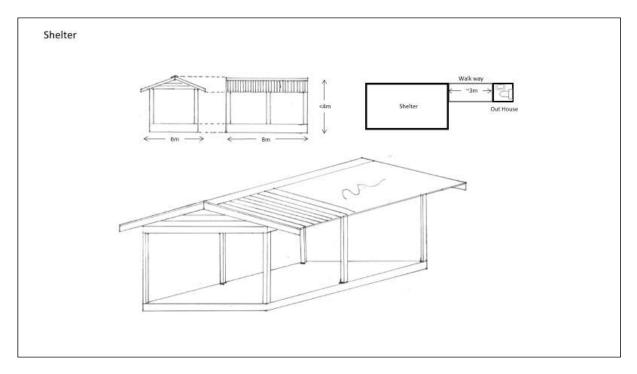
Concept Drawing 1 – Typical Site / Camp Kitchen Shelter Structure
